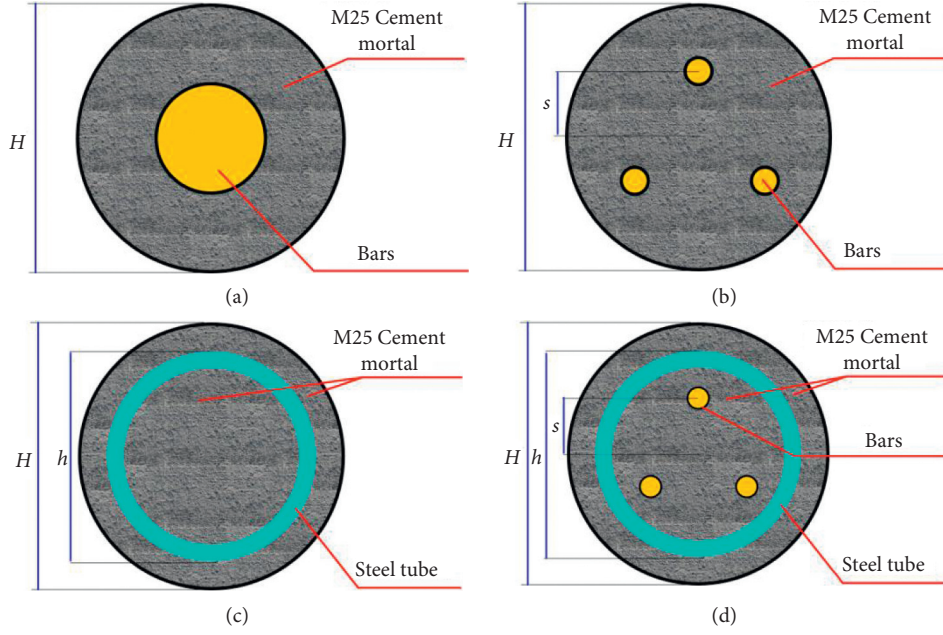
Section form of four typical piles. (a) Type A-1 section. (b) Type A-3 section. (c) Type B section. (d) Type C section.
